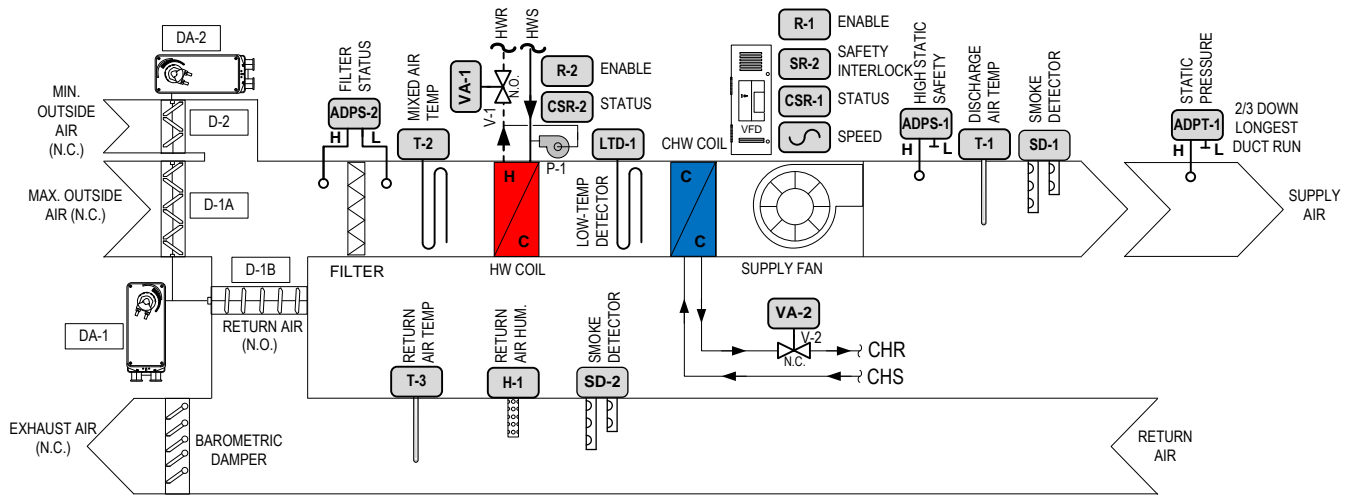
Schematic of a Typical Air-Handling Unit with Maximum and Minimum Outdoor Air Dampers
